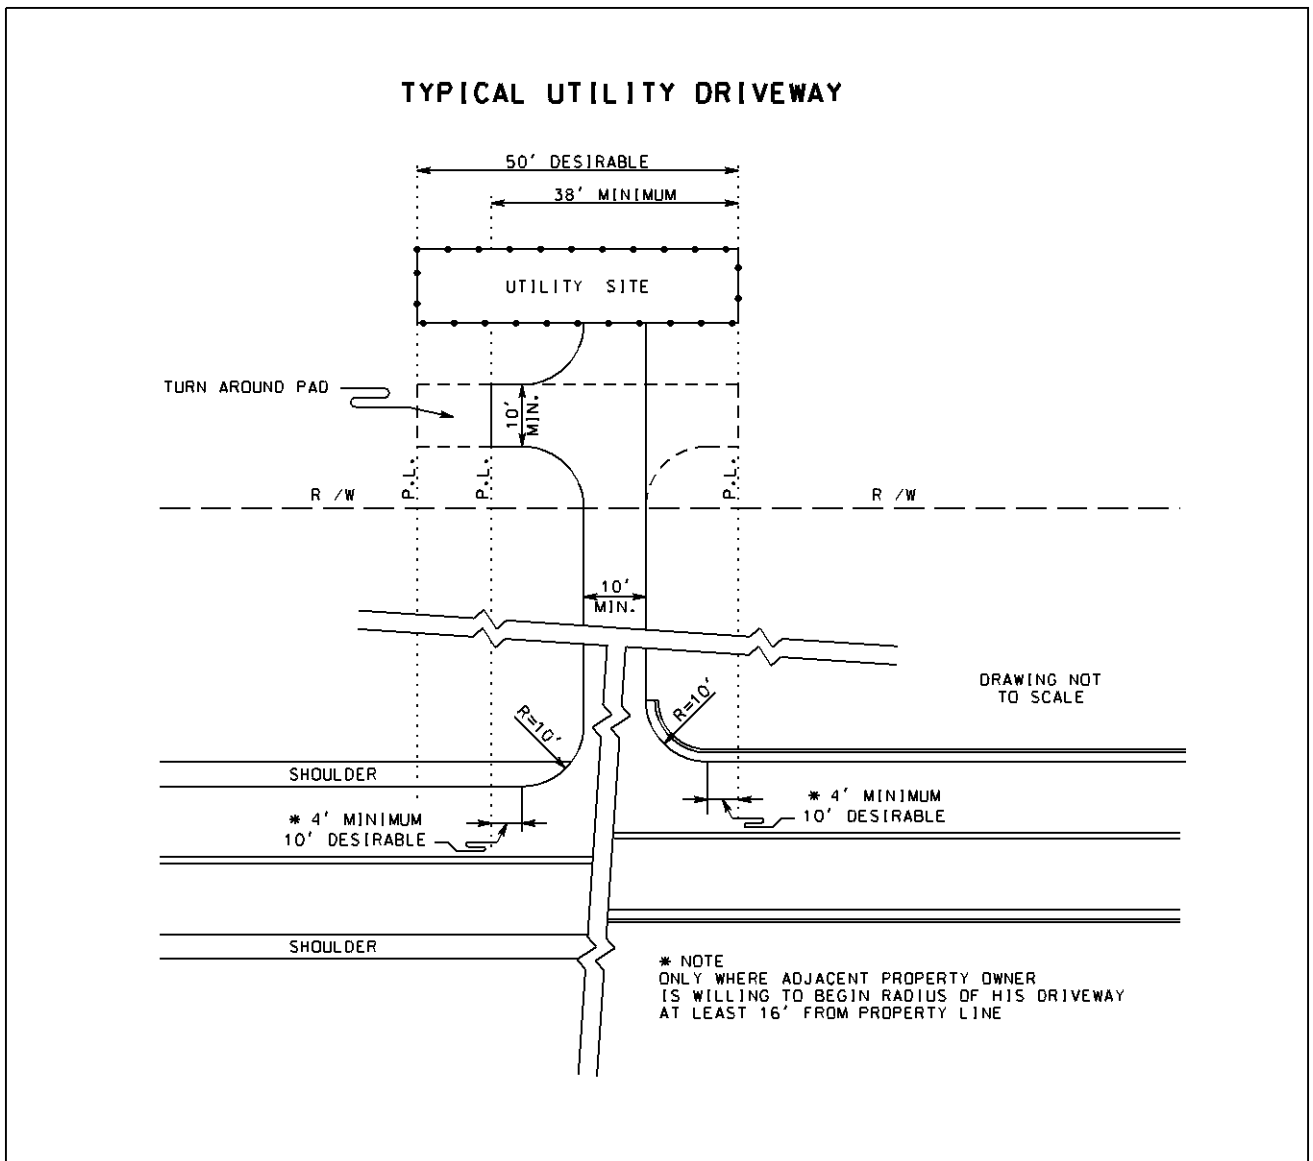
TYPICAL UTILITY DRIVEWAY
